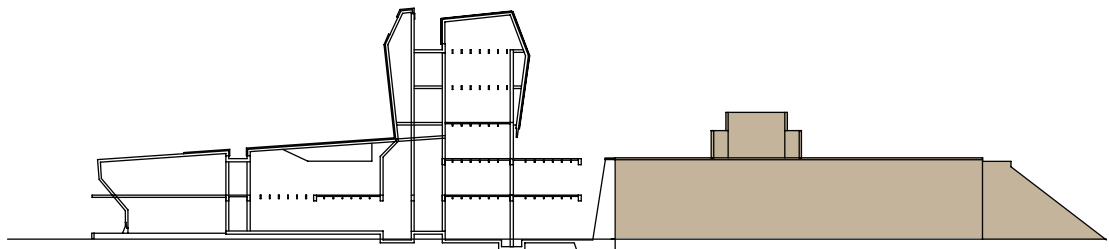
Response to existing concrete platform on short section (Author:2018)
